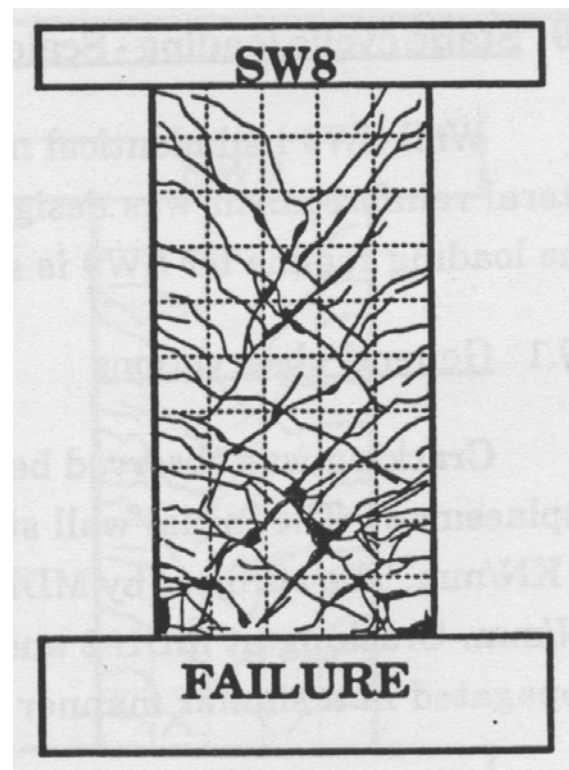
Condition of wall SW8 at 2.17% drift [Pilakoutas (1991)]
